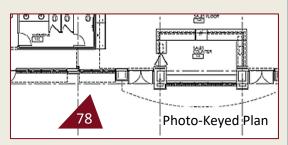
(Above, Right) – Plan is used for demonstrative purposes only, to illustrate proper photo-documentation and labelling, and does not represent a project reviewed by KHC. Image sourced from: https://www.officespace.com/ky
